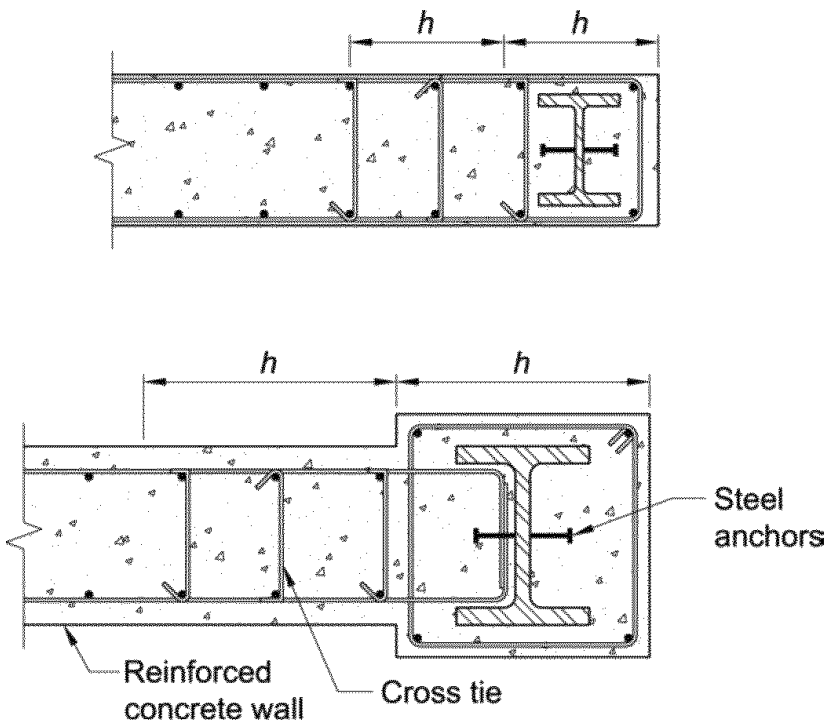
Reinforced concrete walls with composite boundary element.
